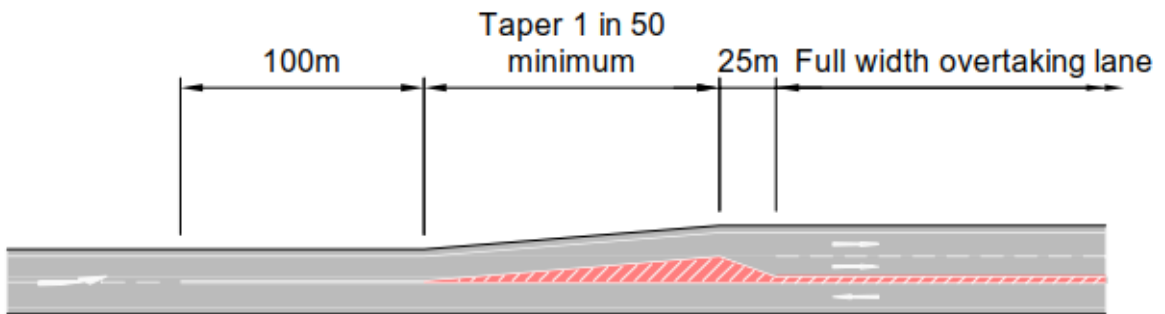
WS2+1 start of overtaking lane section with widening on right-hand side
